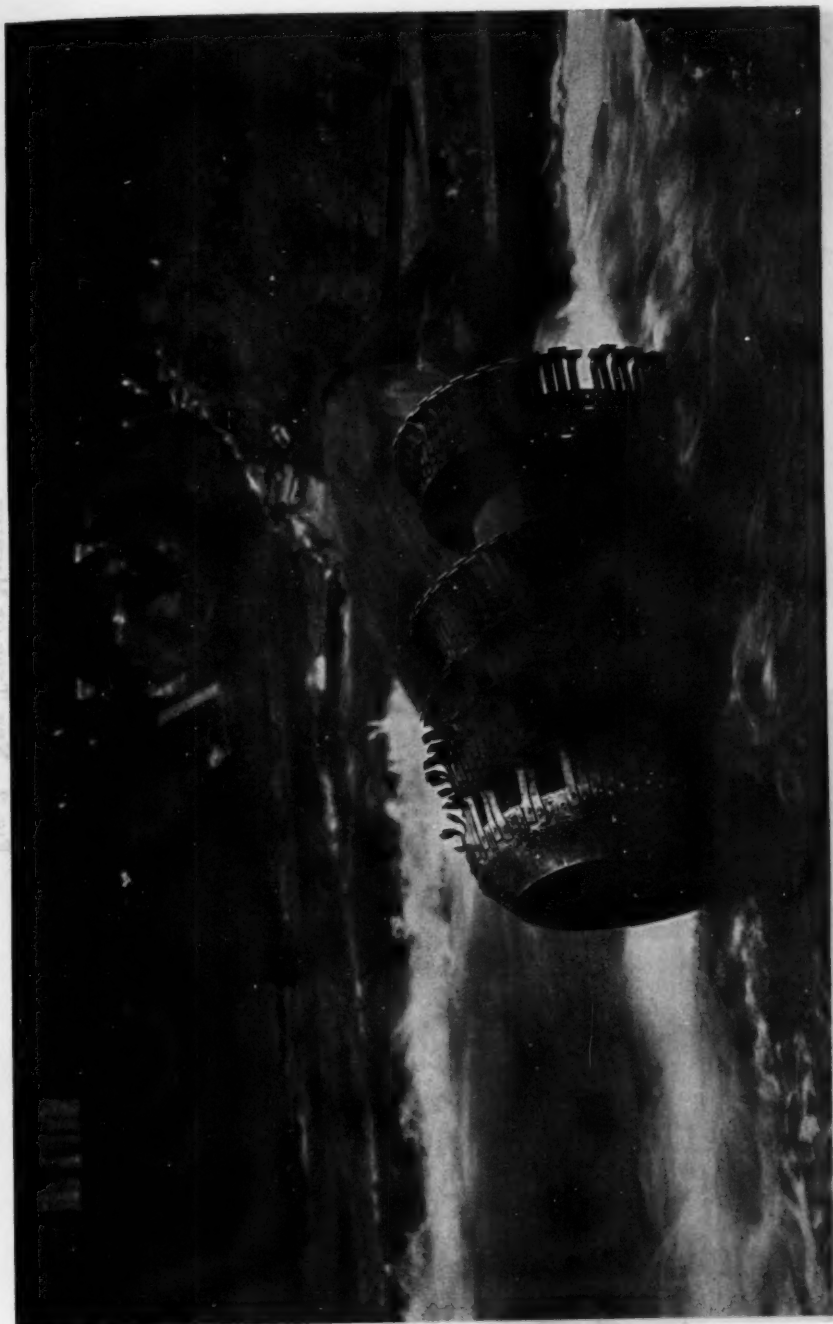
OLD TYPE MACHINE FOR CLEANING MAINS
